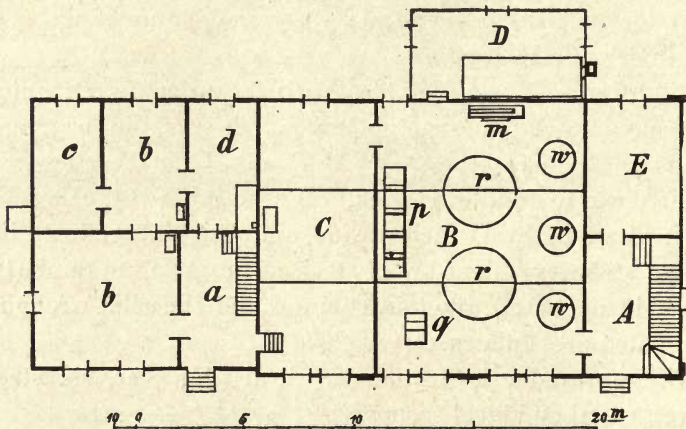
Ground plan of an oil factory building (Knäbel).
